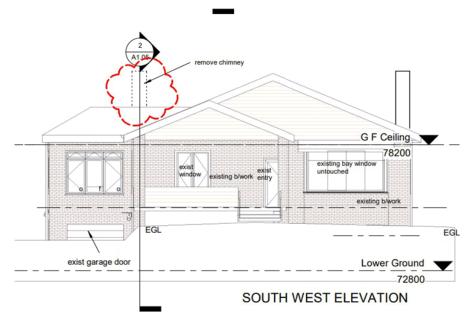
The chimney that has been removed is shown dashed on this front elevation plan.
